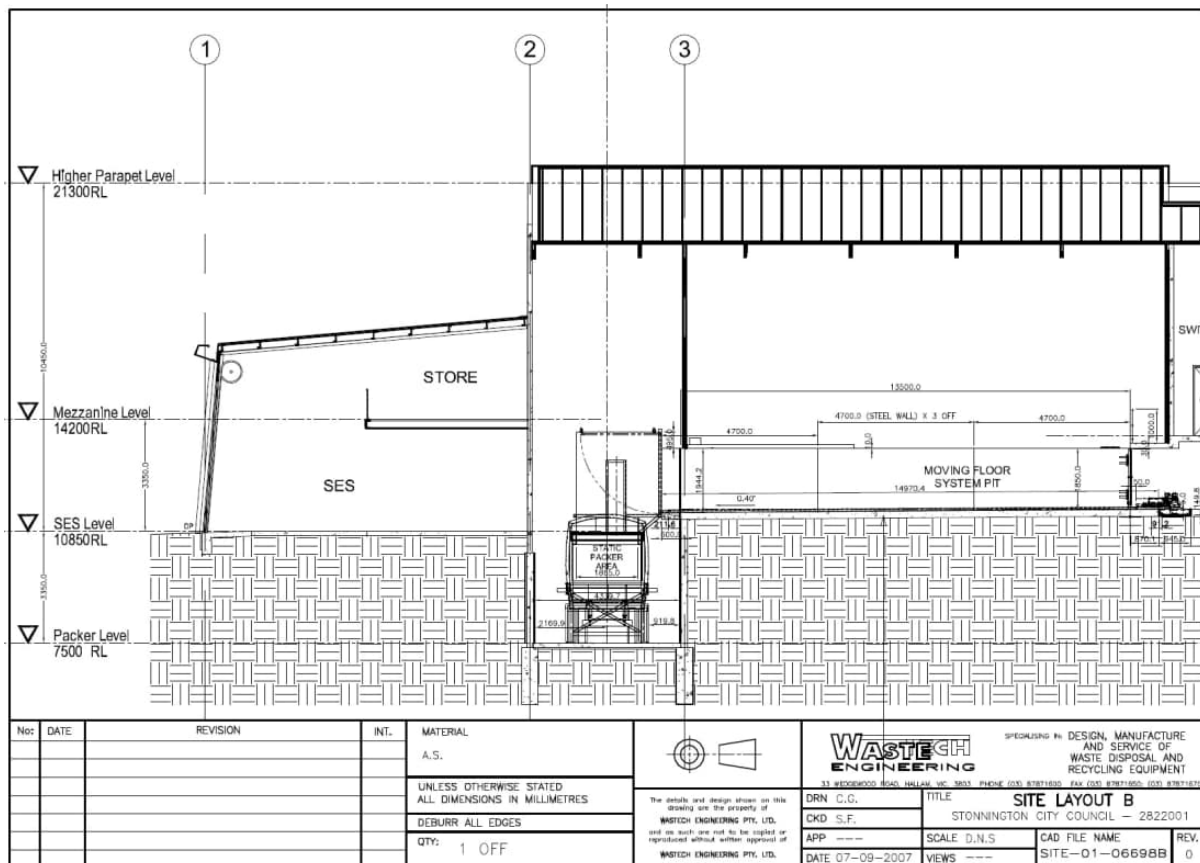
Wastetech moving floor and static packer arrangement⁶
